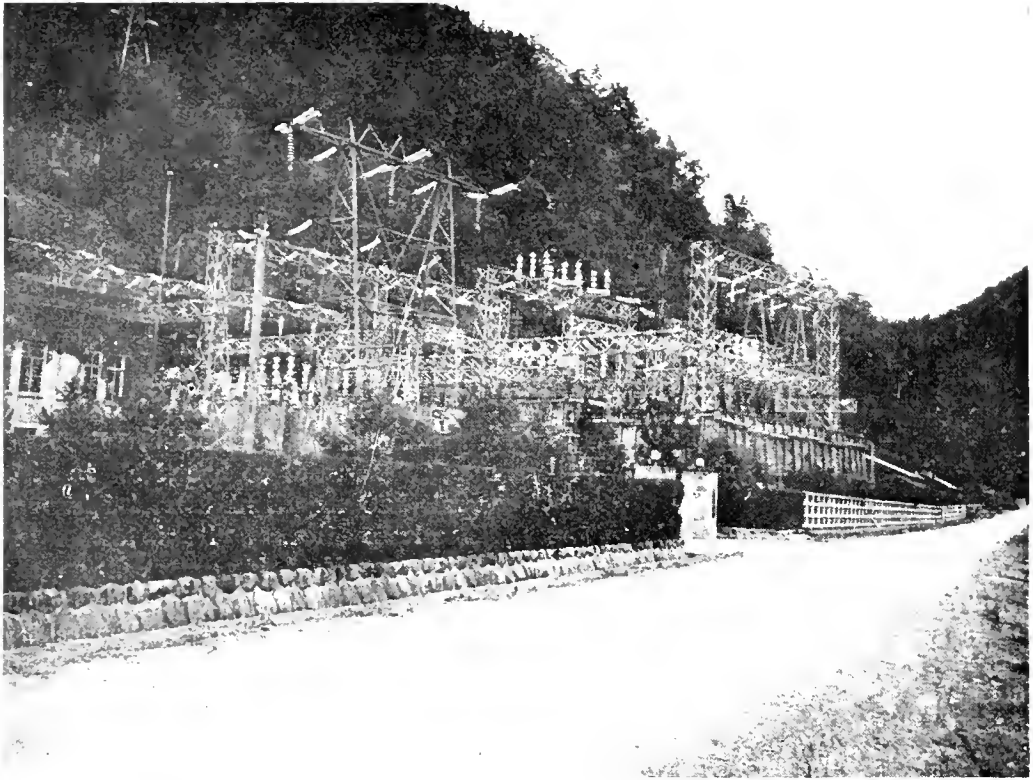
Seto Plant — Outdoor switching and transformer station. Note blast protection barriers. Edge of camouflaged plant at left of picture
